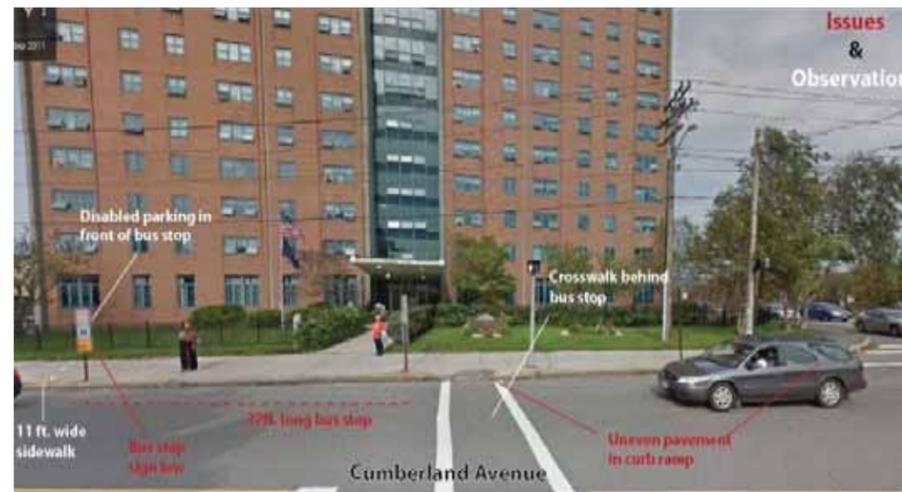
Existing conditions at a far-side stop, located at Franklin Towers on Cumberland Ave
